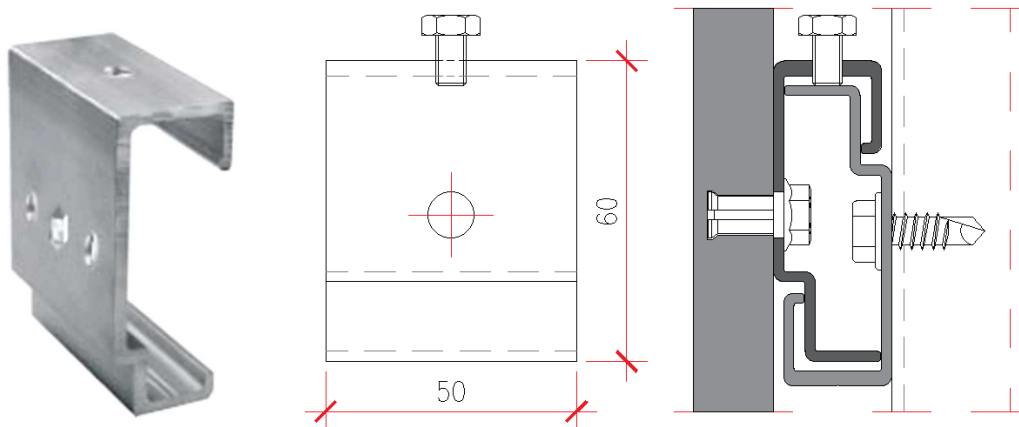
Adjustable clamp, same as fixed clamp with metric screw for adjustment
